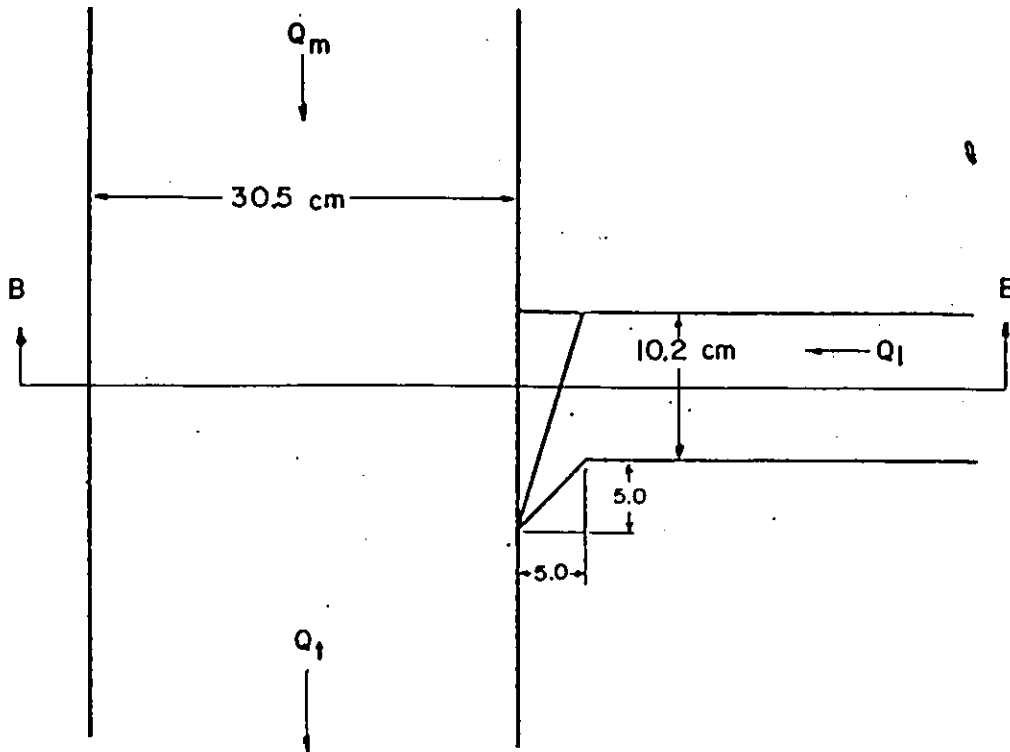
Plan View of Beveled Outlet with Small Deflection Wall
